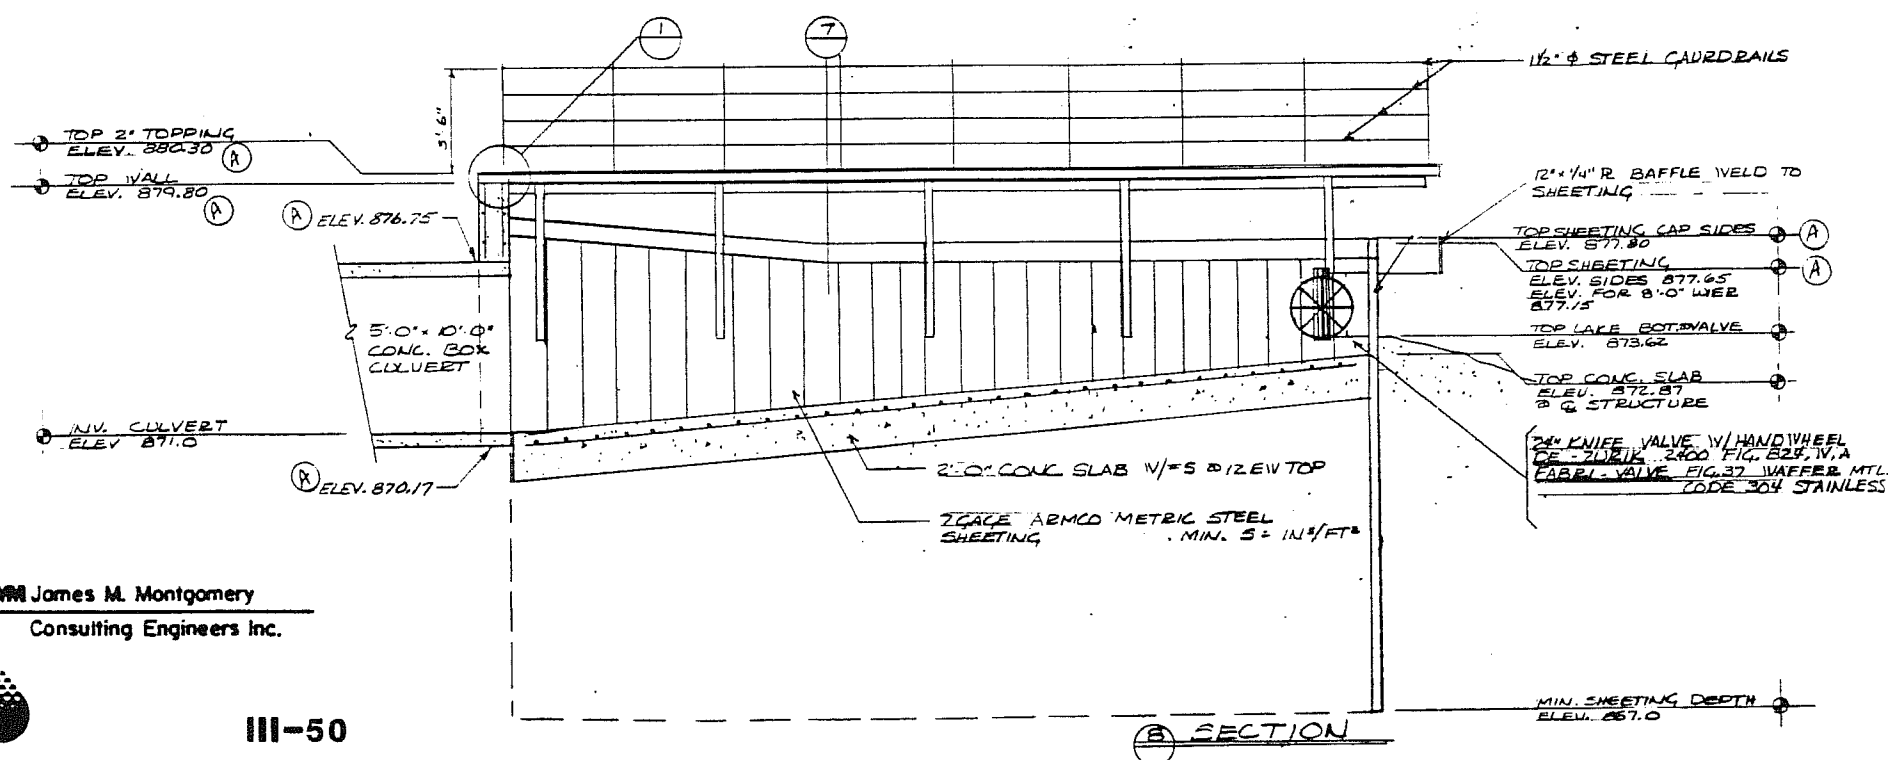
LAKE JOHANNA OUTLET STRUCTURE DETAIL.
